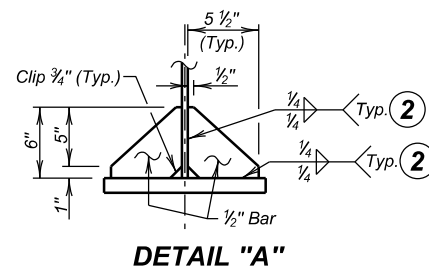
DETAILS OF STIFFENERS AT CENTRAL BEARINGS
